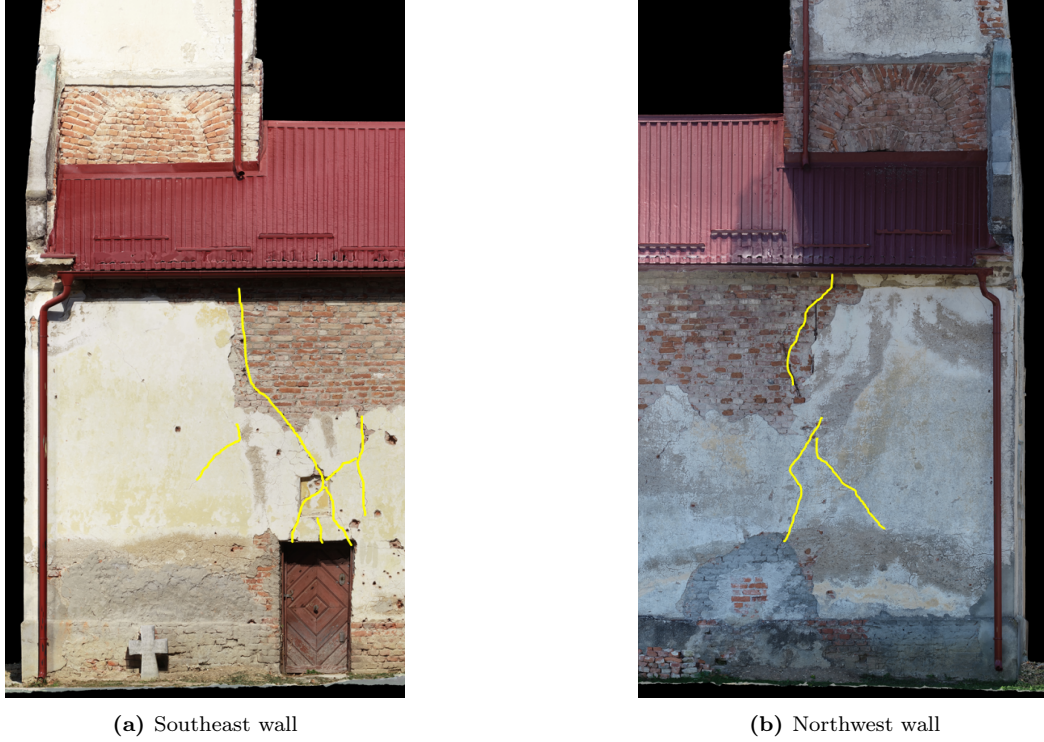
Cracks at the connection between the bell tower and the rest of the church
